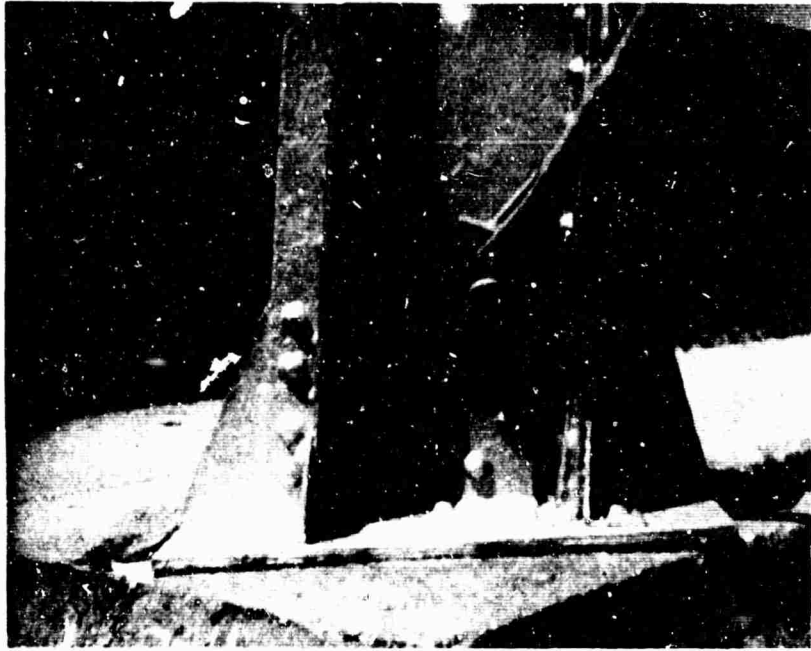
Movie Star of Purvis Water Tower Footing
